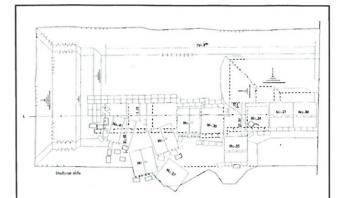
Plan-view of displacement of caissons around breakwater head, First Central Breakwater Hachinohe Port, Japan (Ligteringen 1996).
